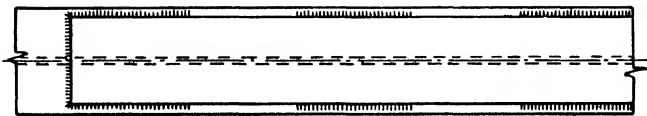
STIFFENERS FOR PLATE GIRDER WEBS
